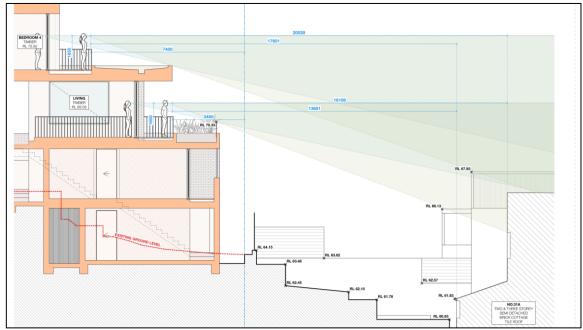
Privacy section to 31A and 31 Varna Street (Source: Baikie Corr Architecture).
